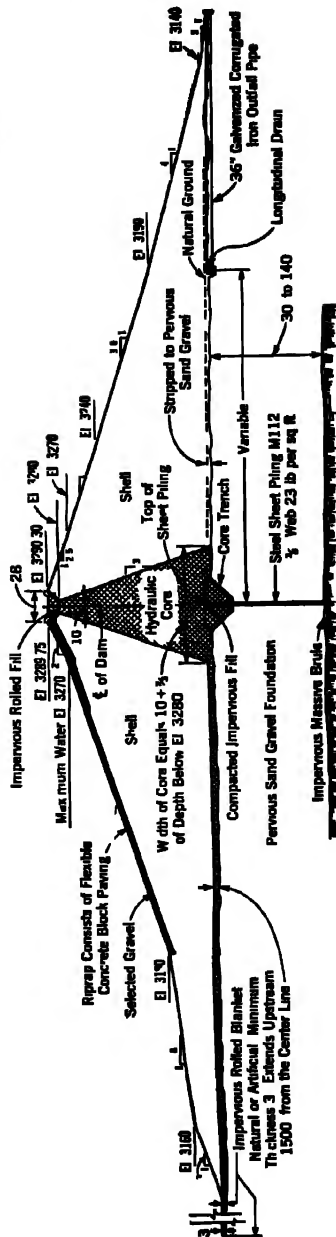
Kingsley hydraulic fill dam Ogallala Nebr
